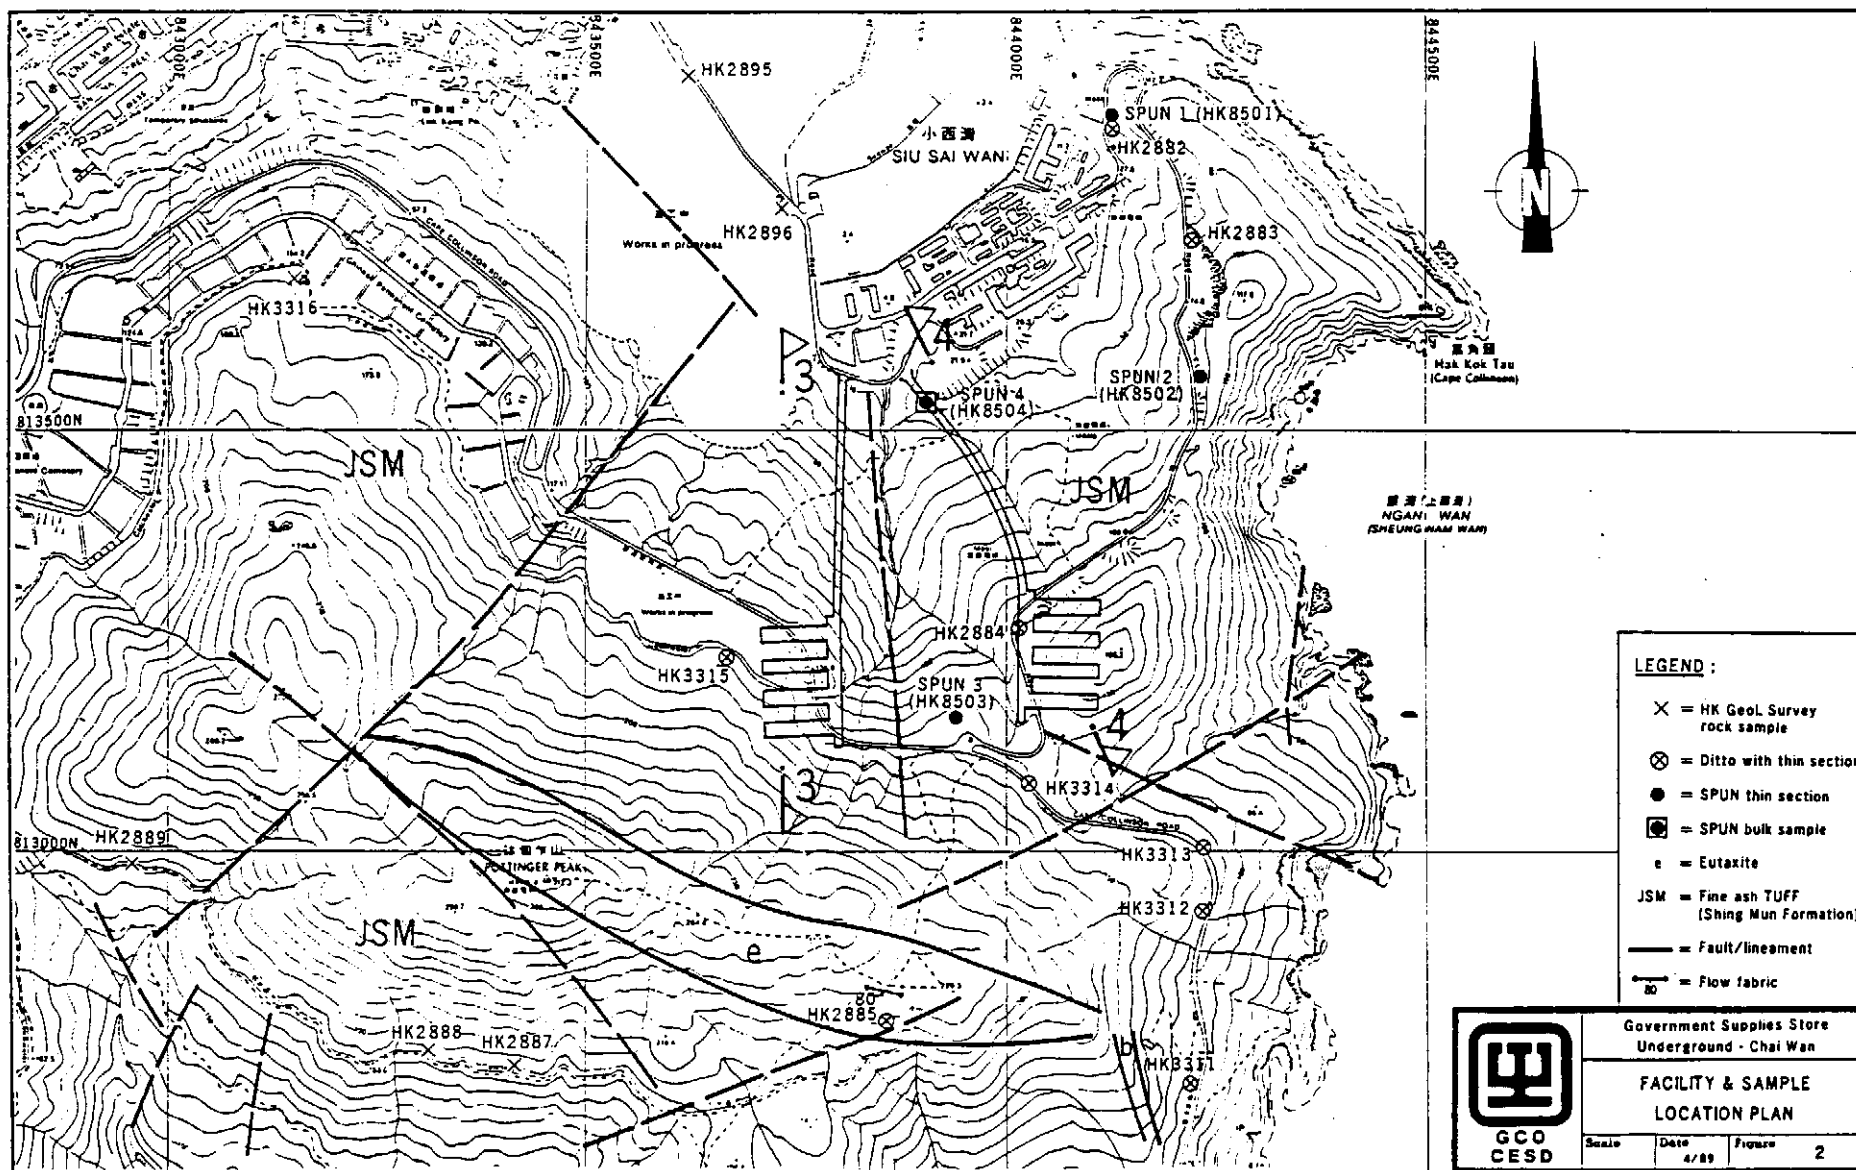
Geology and Sample Location Plan - Proposed Chai Wan Underground Facilities (Approx. Scale 1 : 6000)
